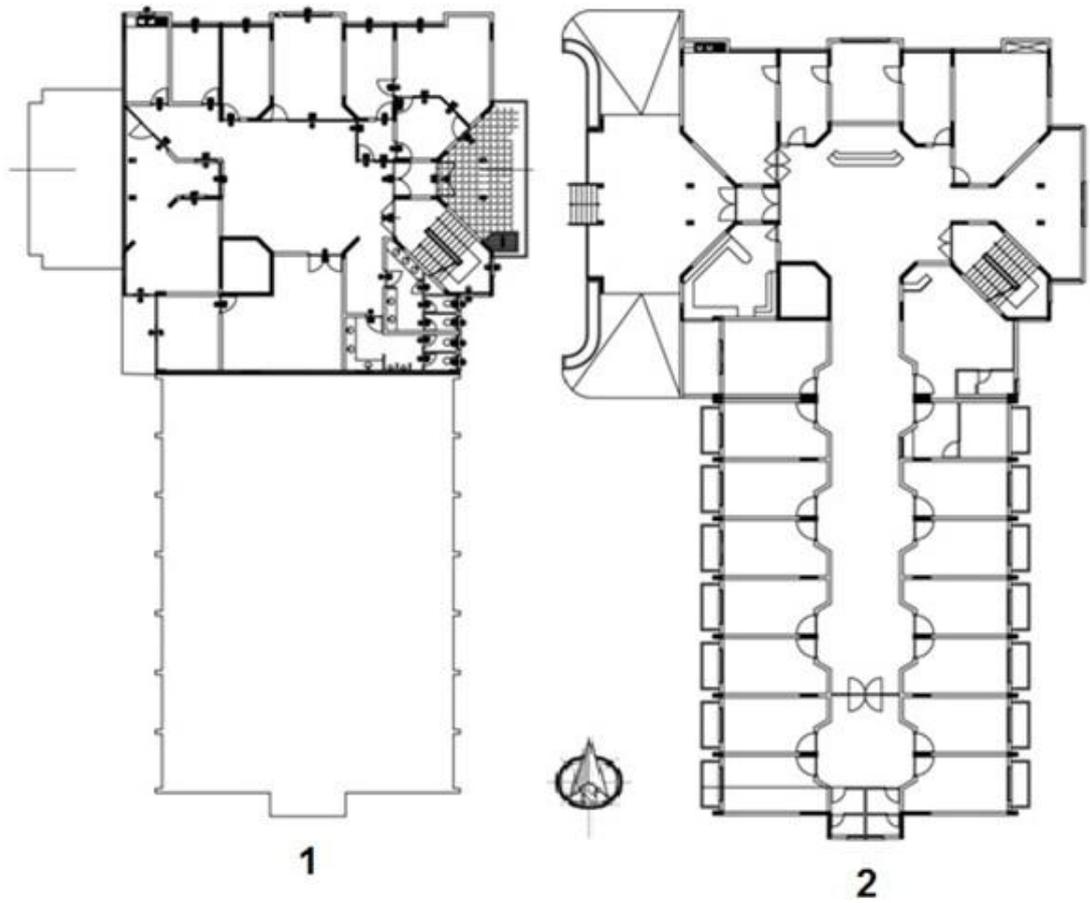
Underground, 2 Ground Floor Plan of the Health Center Building
